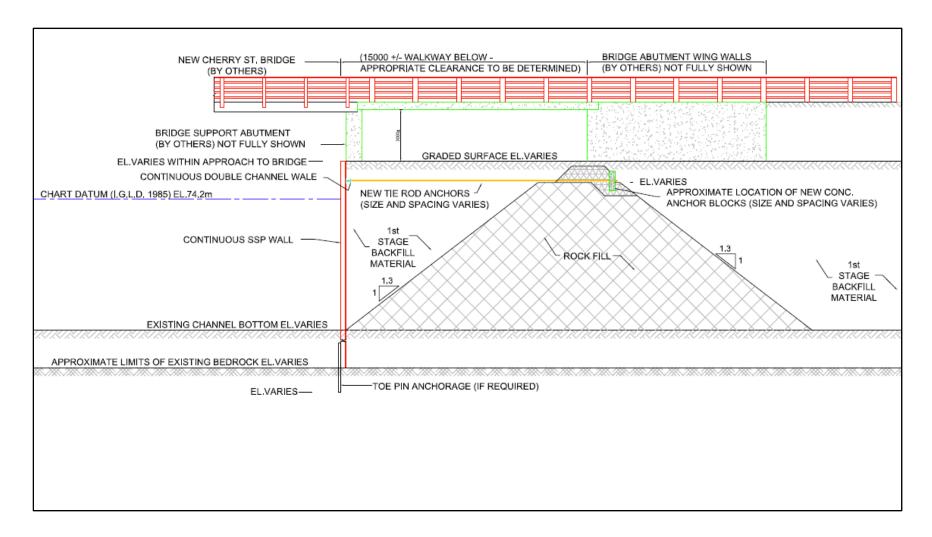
Proposed Vertical Confinement Cross Section at Cherry Street Bridge
